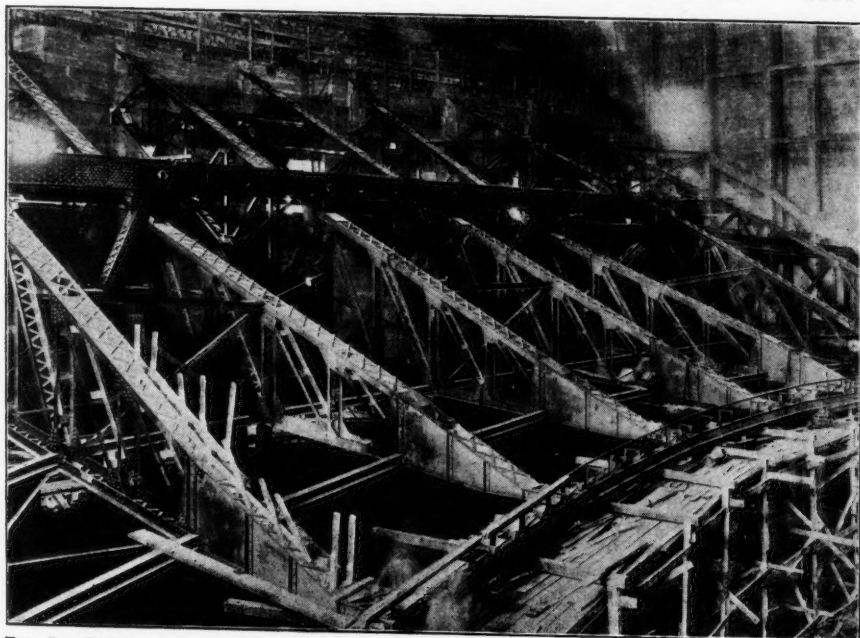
BALCONY TRUSSES CANTILEVERED FROM MAIN TRUSS, T-2. JACK TRUSS, T-1, AT RIGHT, SUPPORTS TWO CANTILEVERS.
